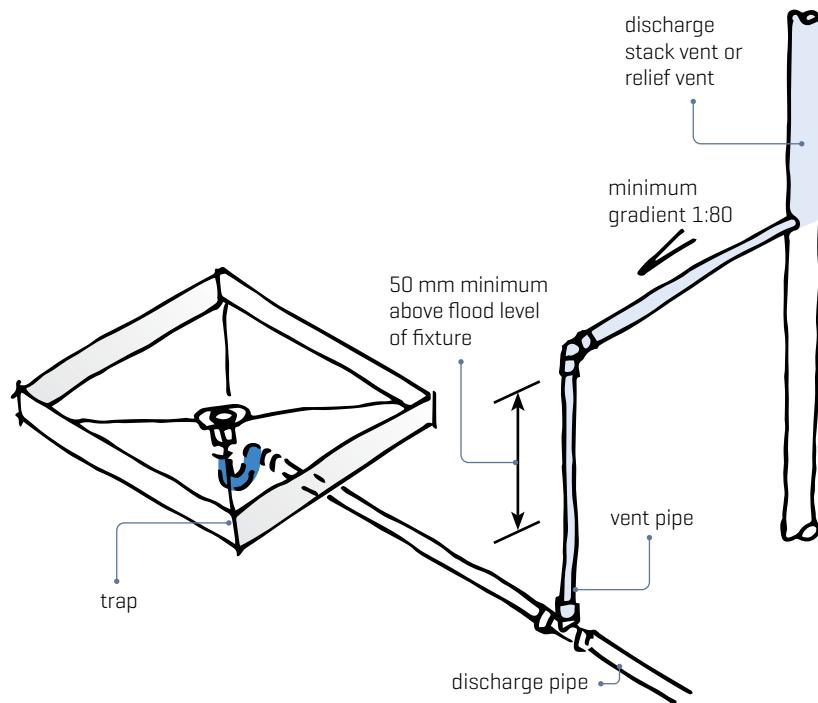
A vent pipe may connect to a branch vent pipe, a discharge stack vent or a relief vent.
